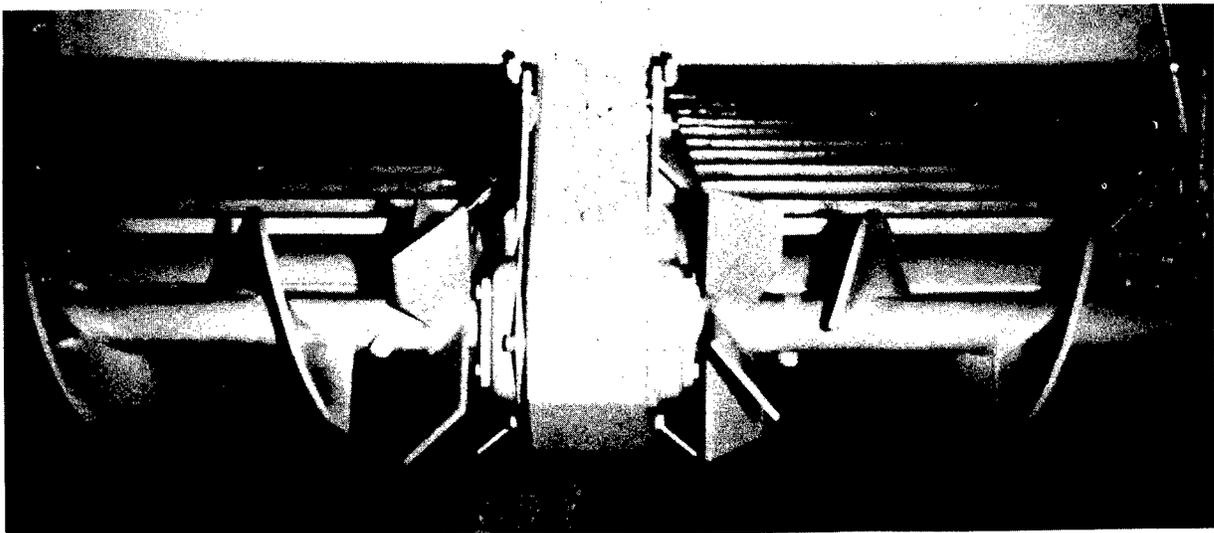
Dual-feed system (slat conveyor and auger) (*Blaw-Knox*).
